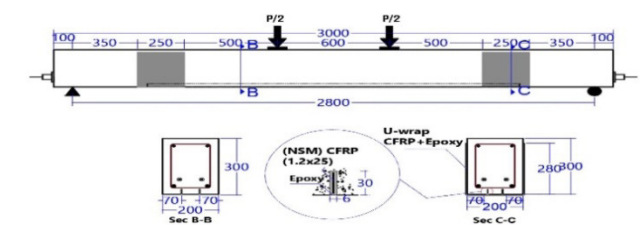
Details of the CFRP-NSM strengthened girders with U-wrap anchors (all dimensions are in mm).
